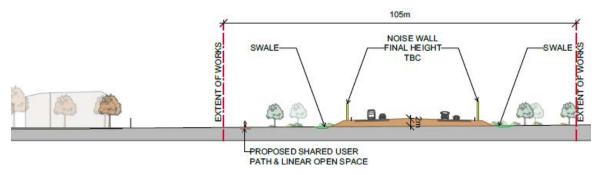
Cross section B1: Bangalow Way open space, looking north west
